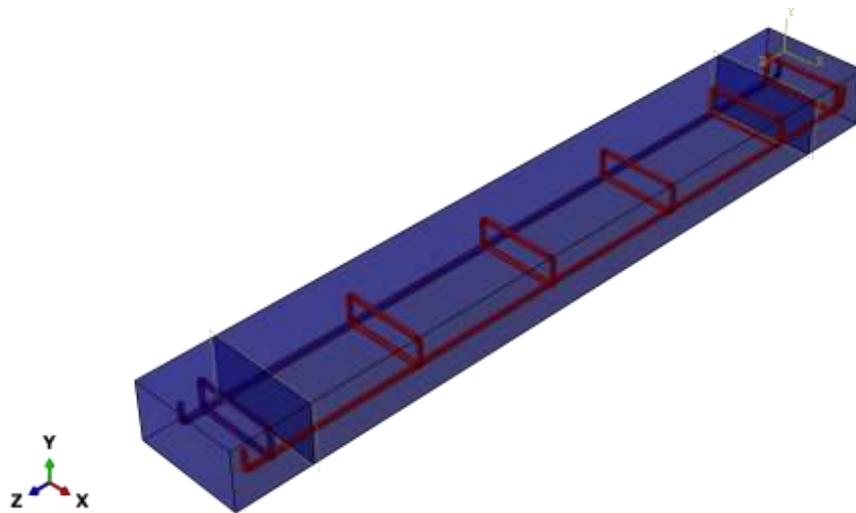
reinforcement bars embedded in the 150mm concrete Beam
